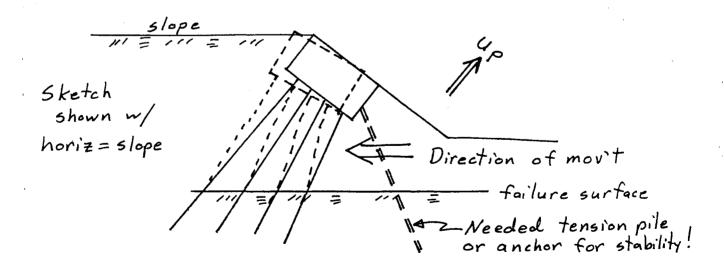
Batter Pile Group on a Steeply Sloping Shear Surface
